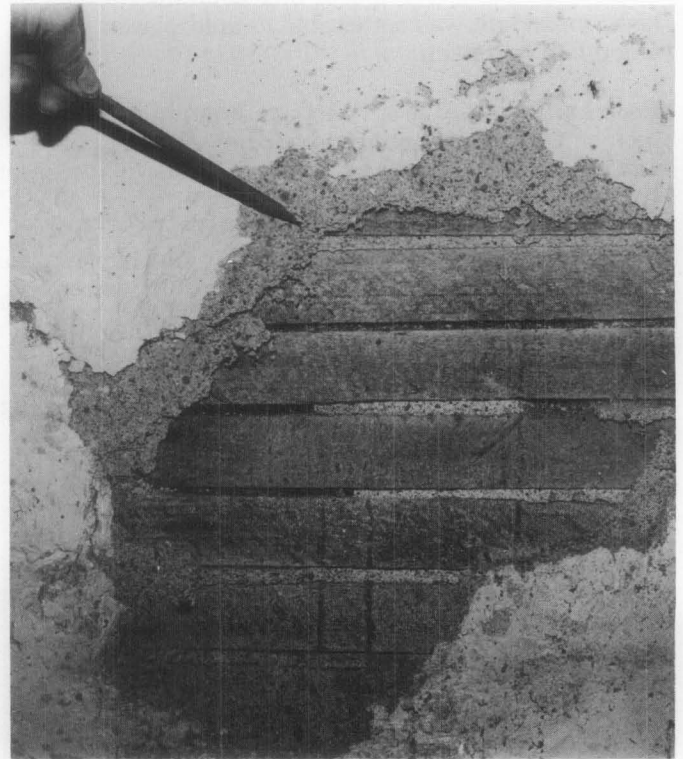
Too much aggregate (sand) and not enough cementing material (lime or gypsum) in the base coat has made this plaster surface weak and crumbly. Besides losing its key with the lath, the layers are disintegrating. It will most likely need to be totally removed and replaced with all new plaster. Photo: Marylee MacDonald.
